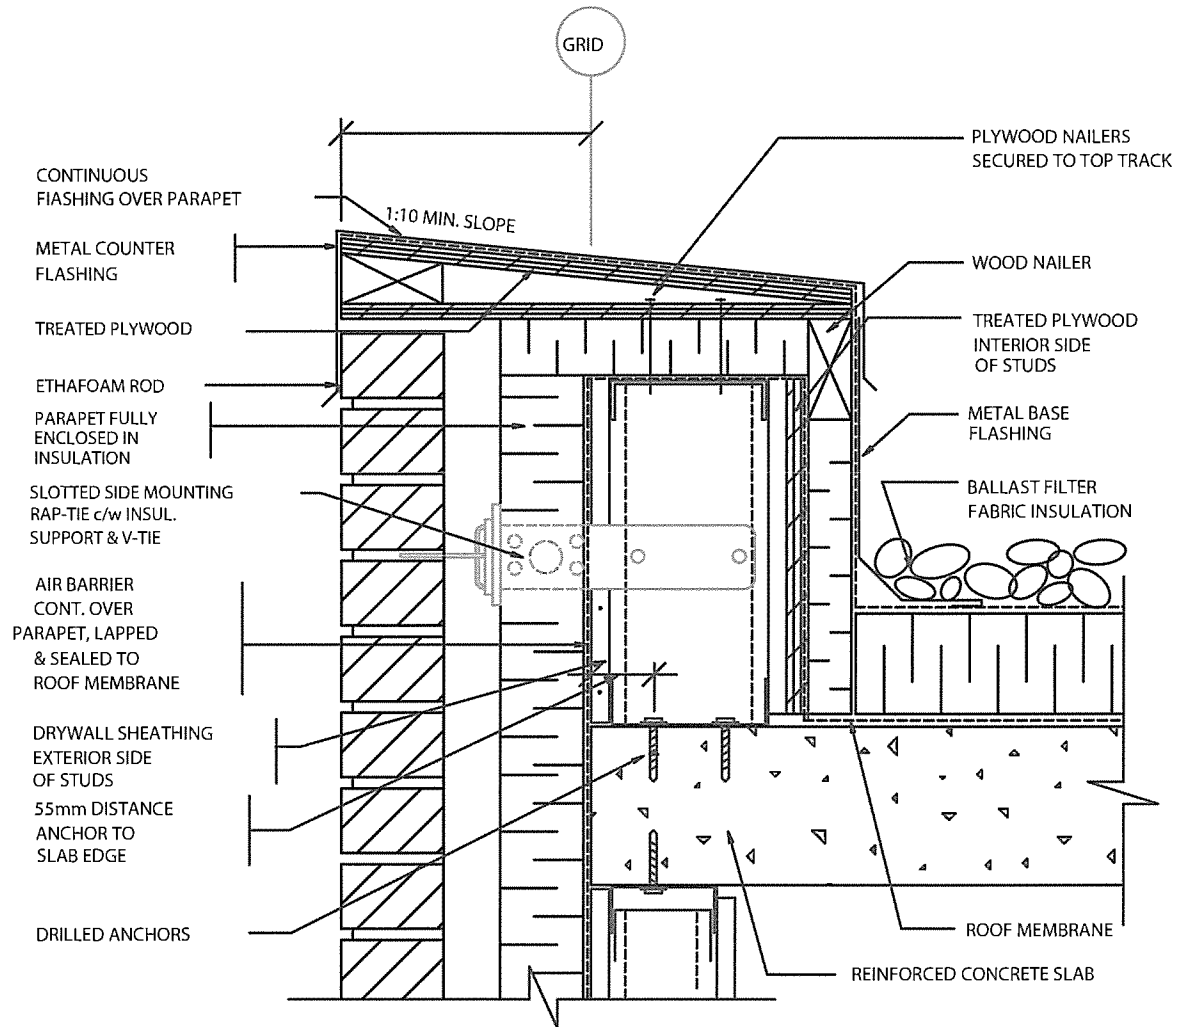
BRICK VENEER / STEEL STUD - DETAIL AT LOW PARAPET
